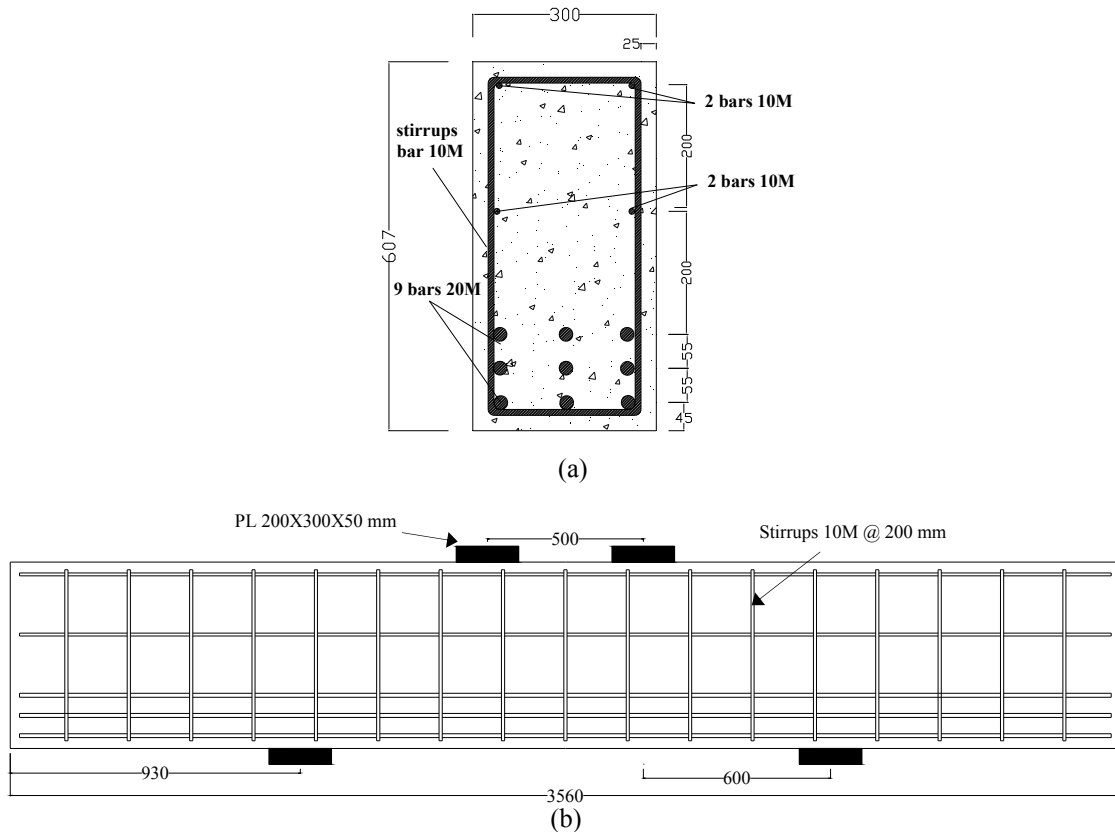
Beam NS1-4: (a) Cross section (b) Elevation
